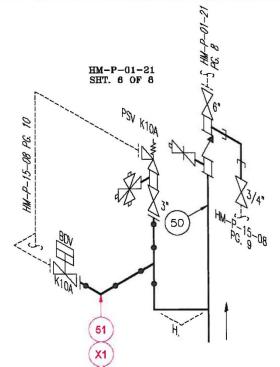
A partial view of isometric drawing HM-P-01-21, sheet 6 of 8. The location of profile radiography (X1) is shown in red.
